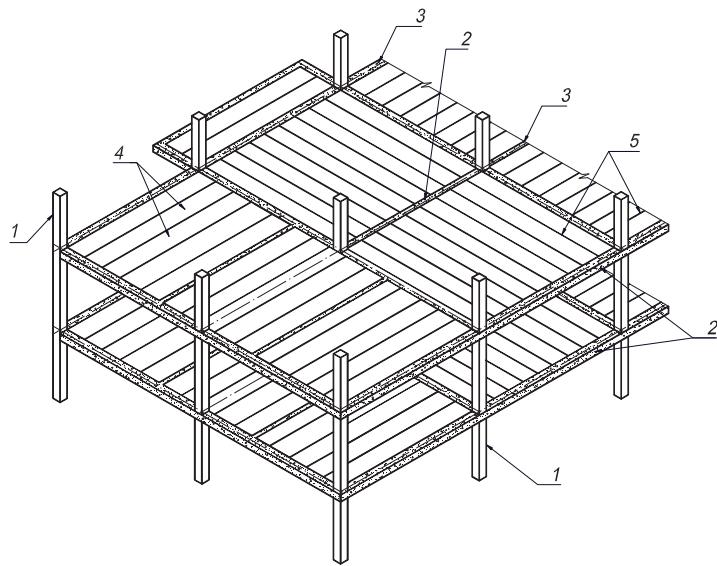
Diagram of steel and concrete frame based on light metal structures and hollow concrete ceiling slabs: 1 - column; 2 – bearing steel and concrete girder; 3 – braced girder: 4 – hollow concrete ceiling slab; 5 – between-slab seam
